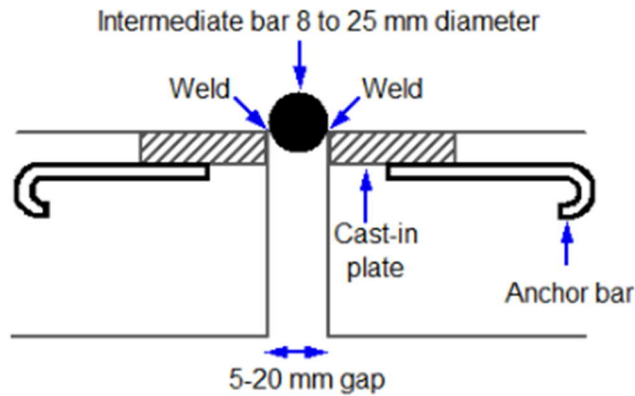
Mechanical joint (The Concrete Centre, 2017)
